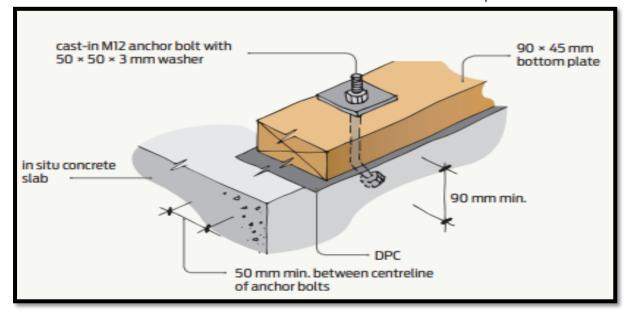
Cast in M12 anchor bolt, sourced from BRANZ Build magazine.
